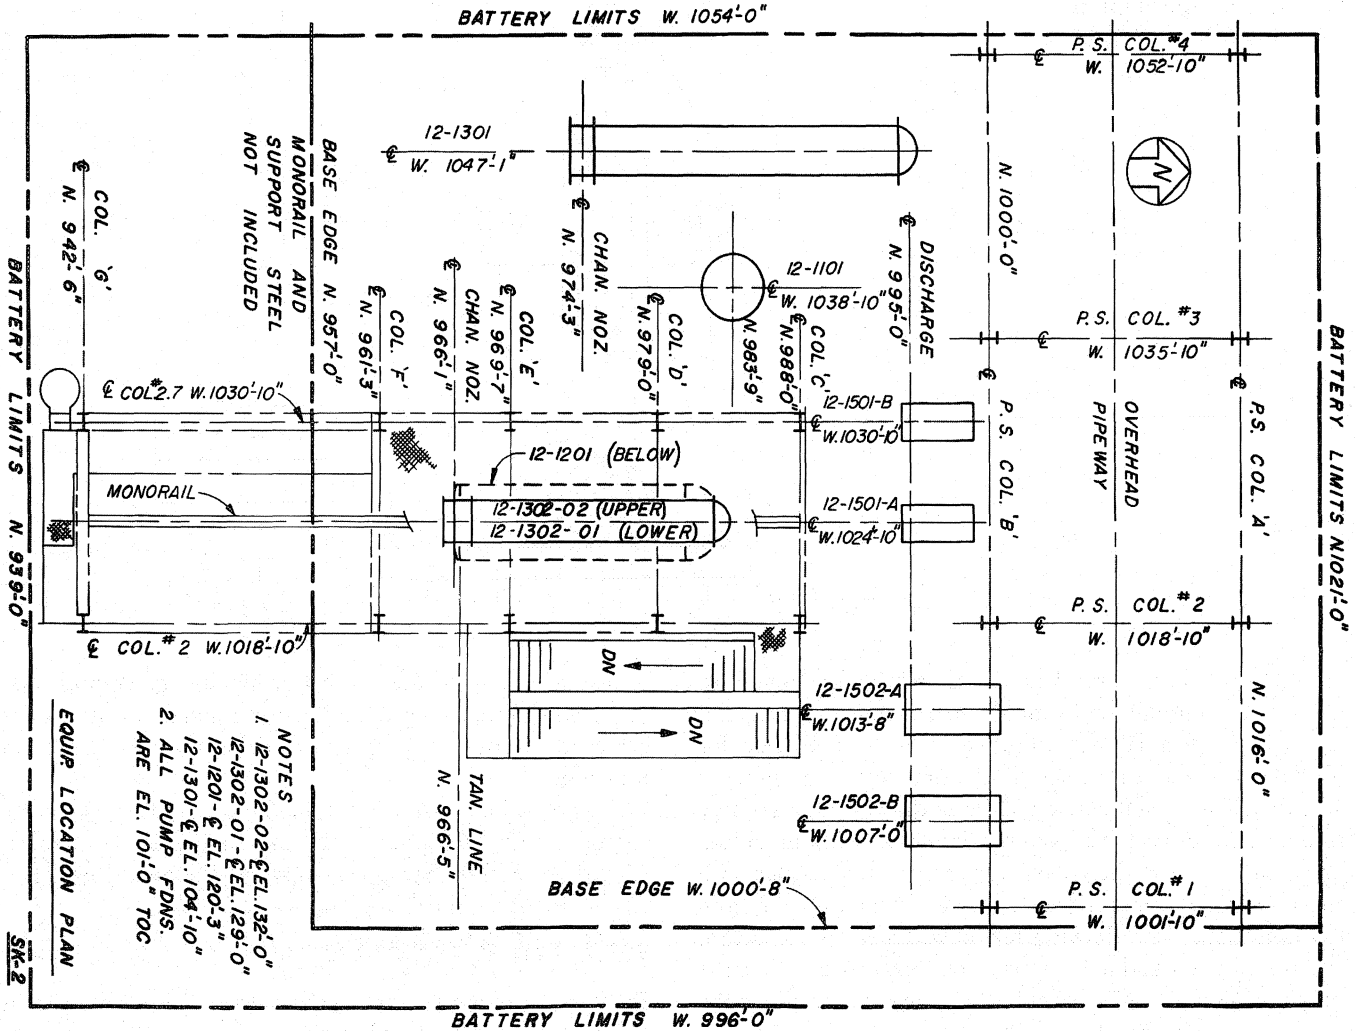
Example of a Well-Lettered "D"-Size Drawing
